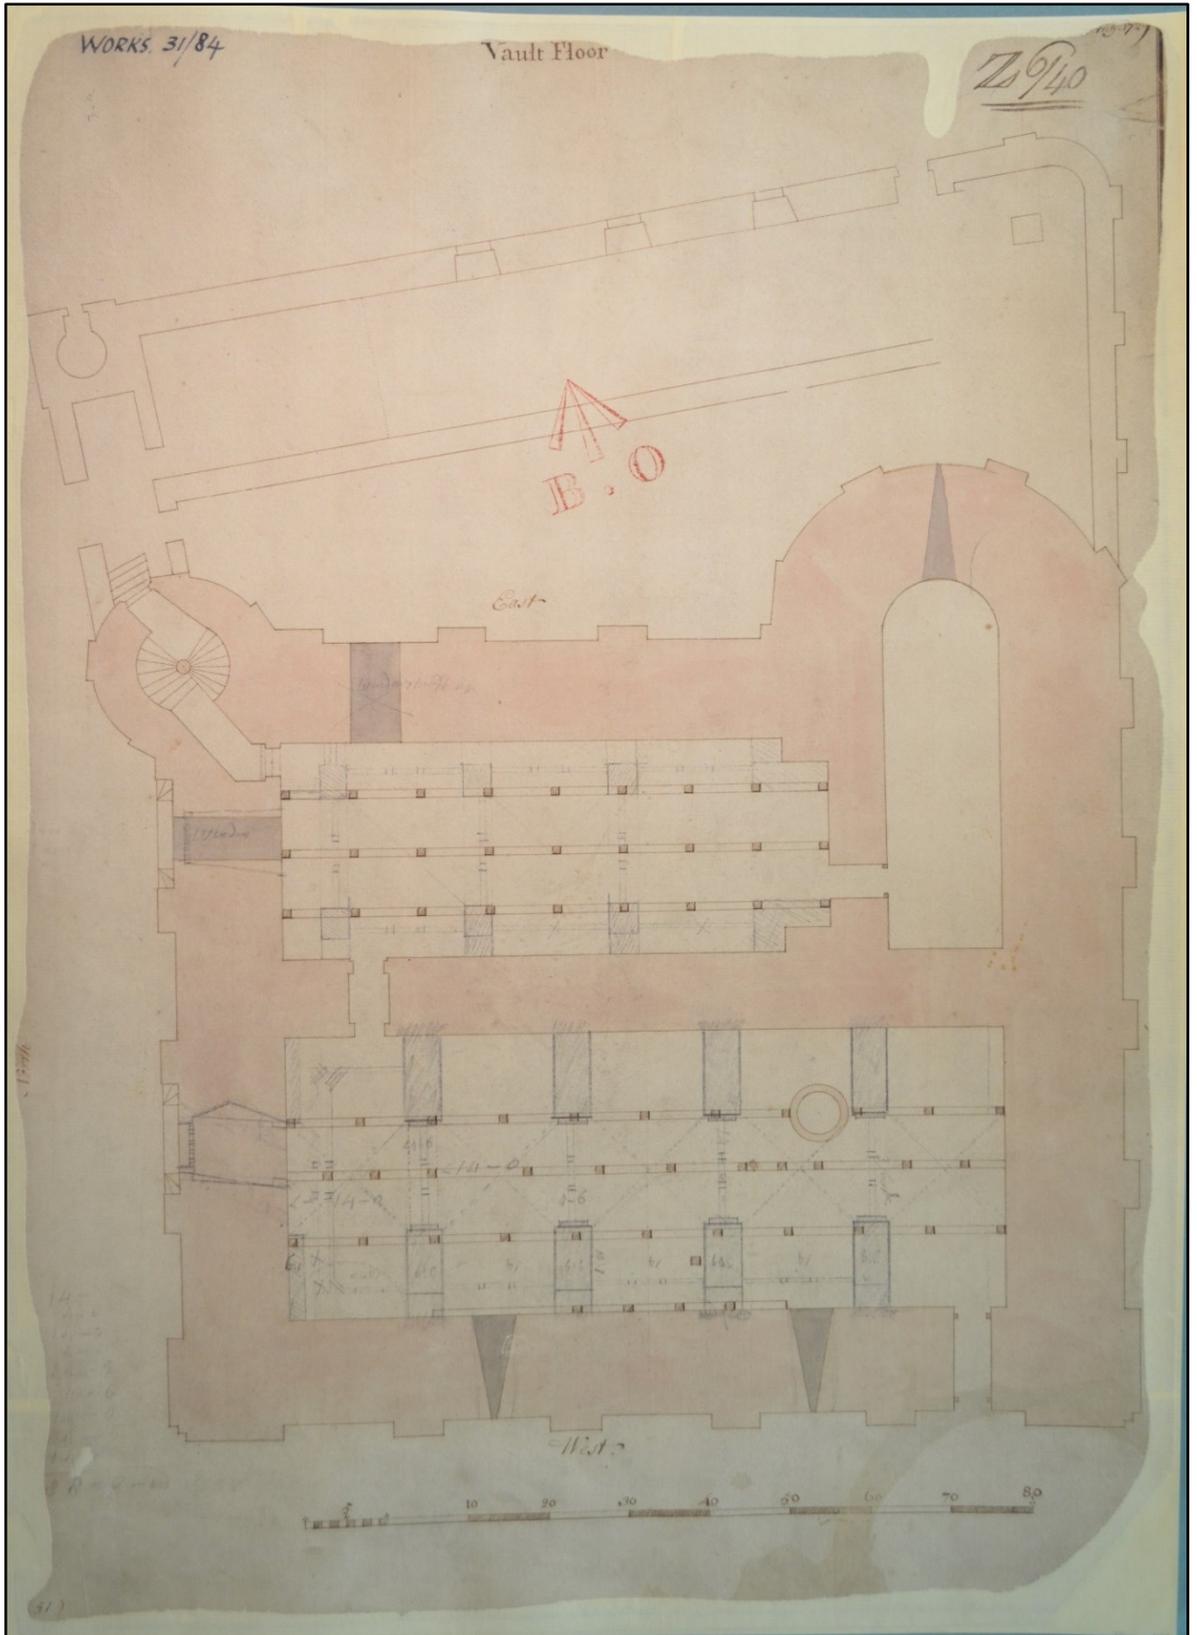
White Tower, vault plan showing internal timber construction, (1729) – [TNA Work 31/84
